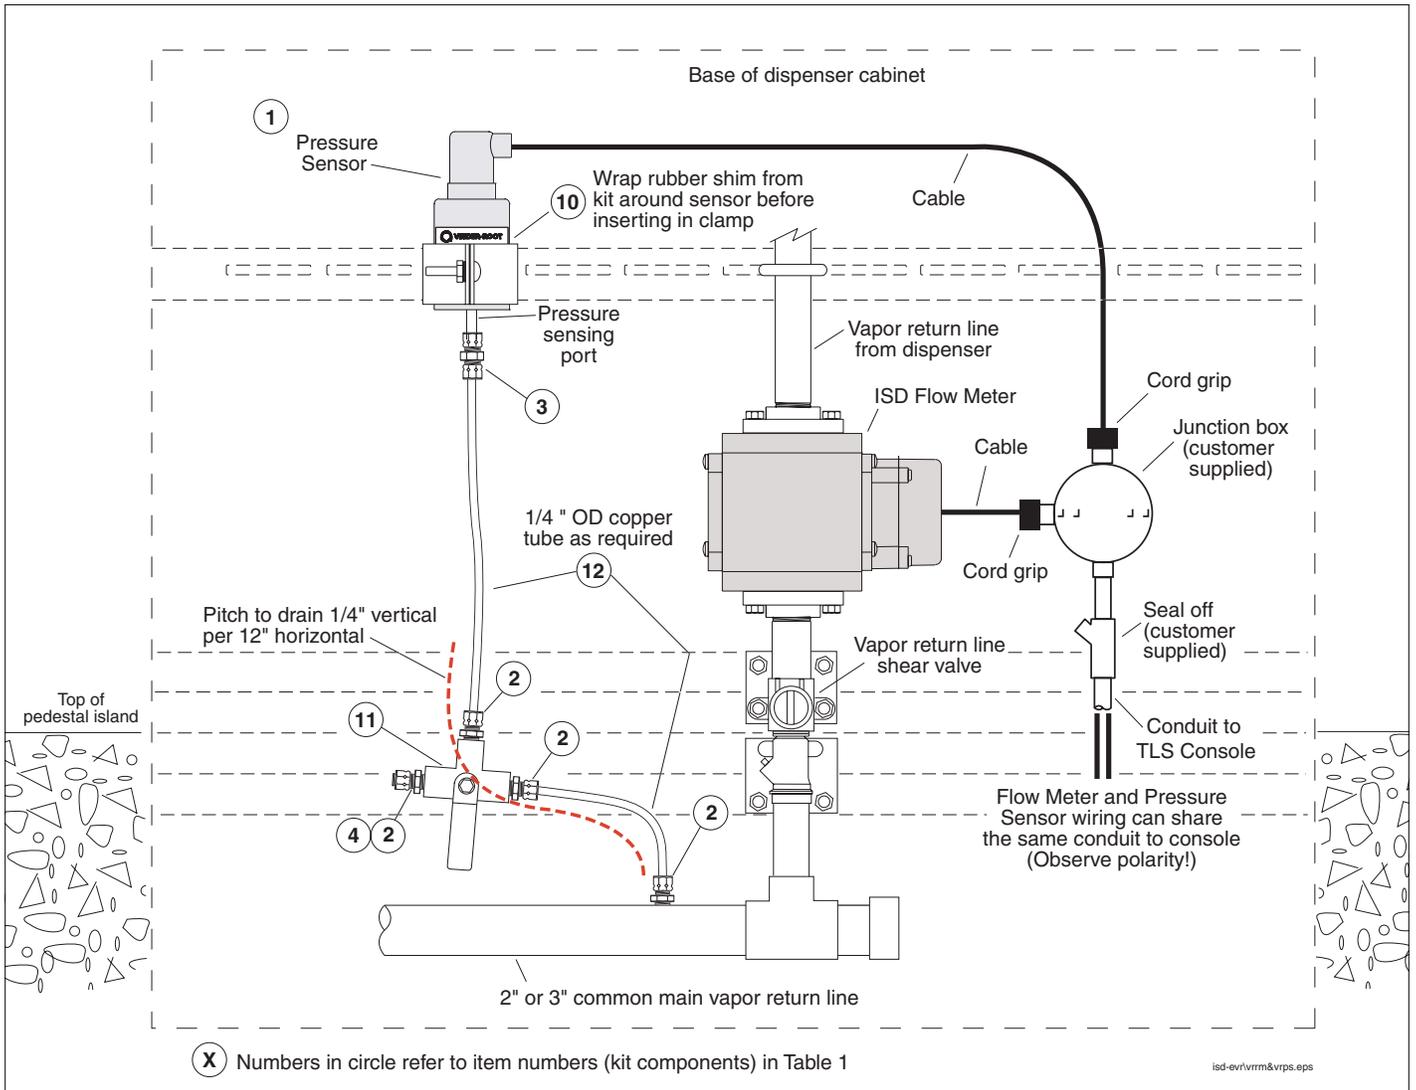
Example Pressure Sensor Install - ISD Installation (with Vapor Flow Meter)
